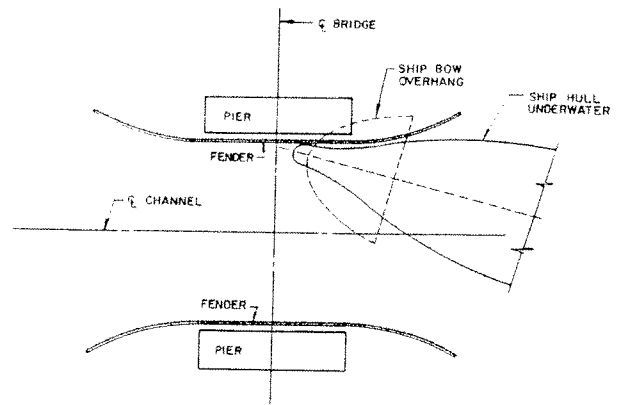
Plan of Ship Bow Overhang Impacting Pier.
